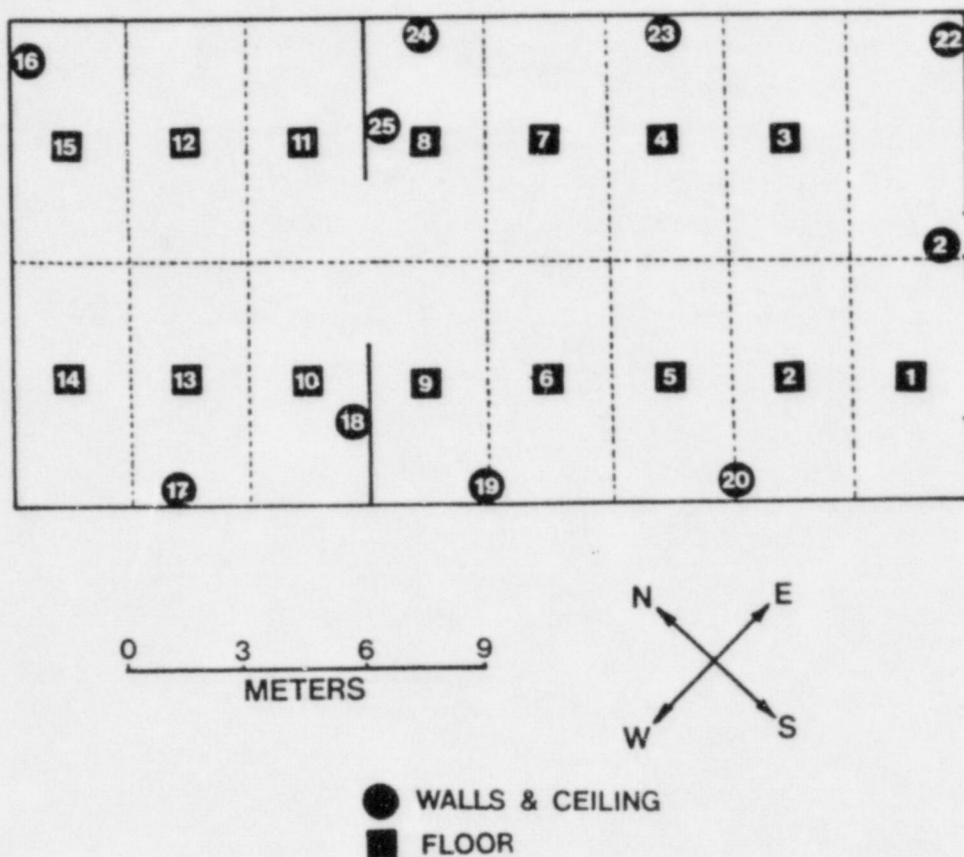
Floor Plan of the Maintenance I Building Indicating Locations of Measurements and Smears
